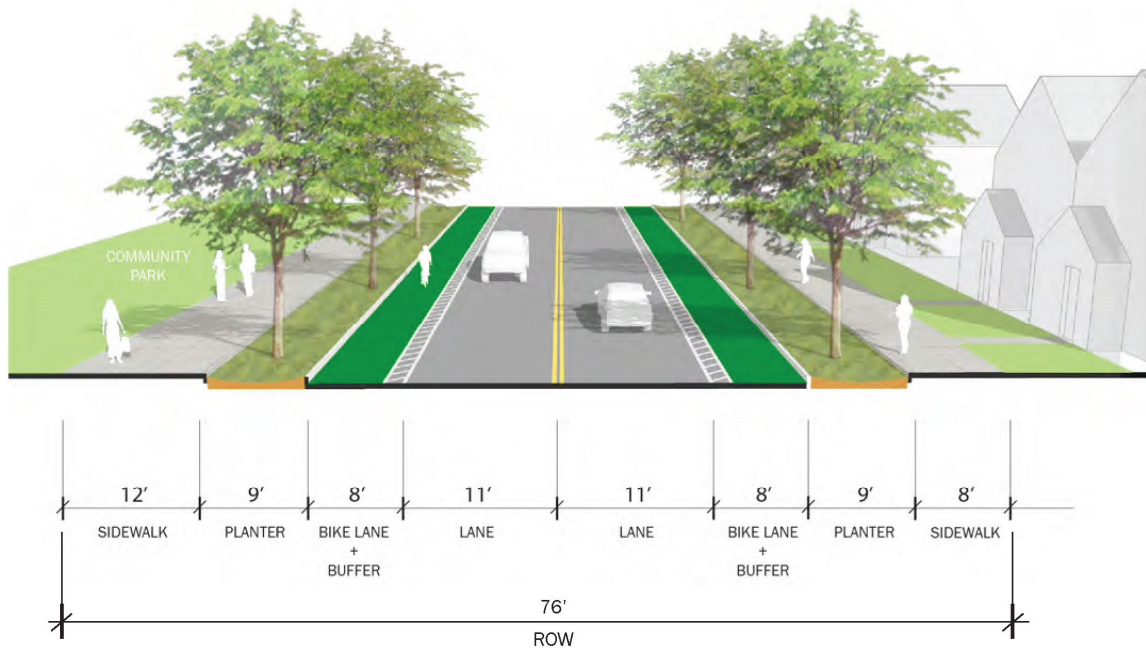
FROG POND EAST AND SOUTH MASTER PLAN CROSS-SECTIONS (CONT.)
